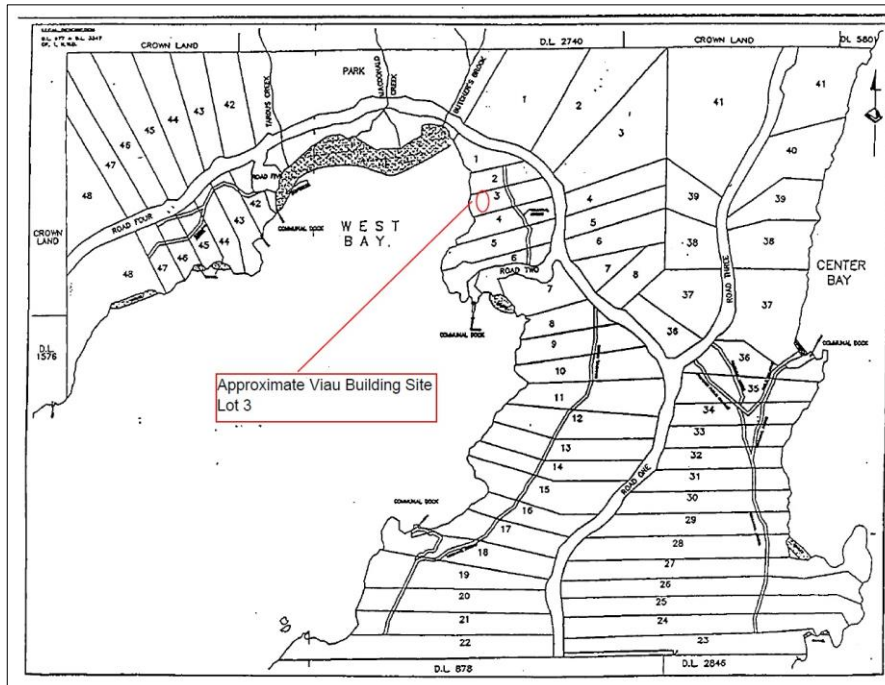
Approximate building site area within Lot 3 shown on Lot Layout for West Bay Subdivision
